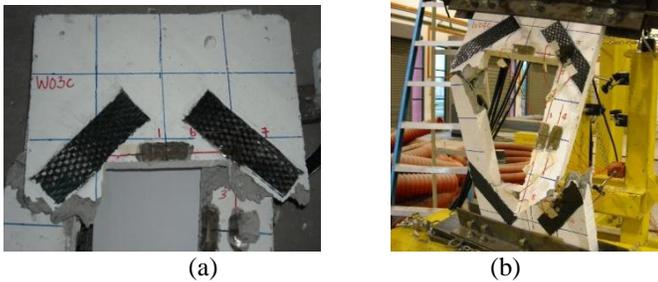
Failure mode of wall panels with openings strengthened with CFRP pattern 2 in tension face.
